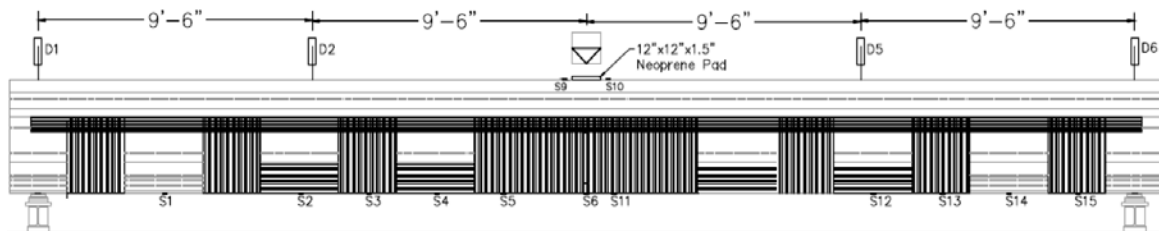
Fatigue loading setup arrangement for full-scaled AASHTO PSC girders
